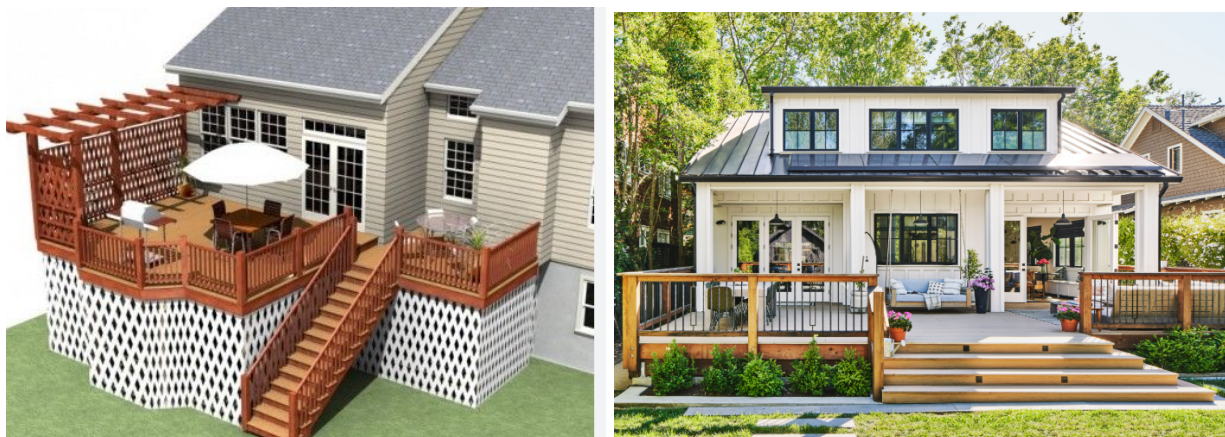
Examples of elevated decks similar to projects proposed in the past that would not comply with current setback requirements
